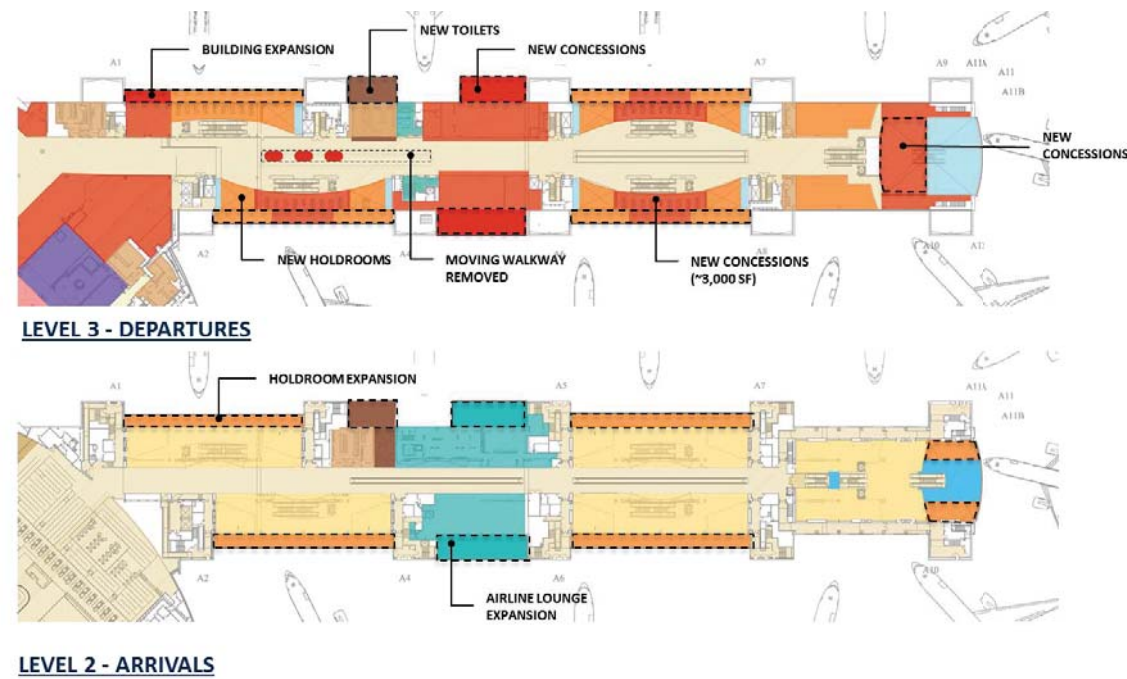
| Boarding Area G Alternative 1
